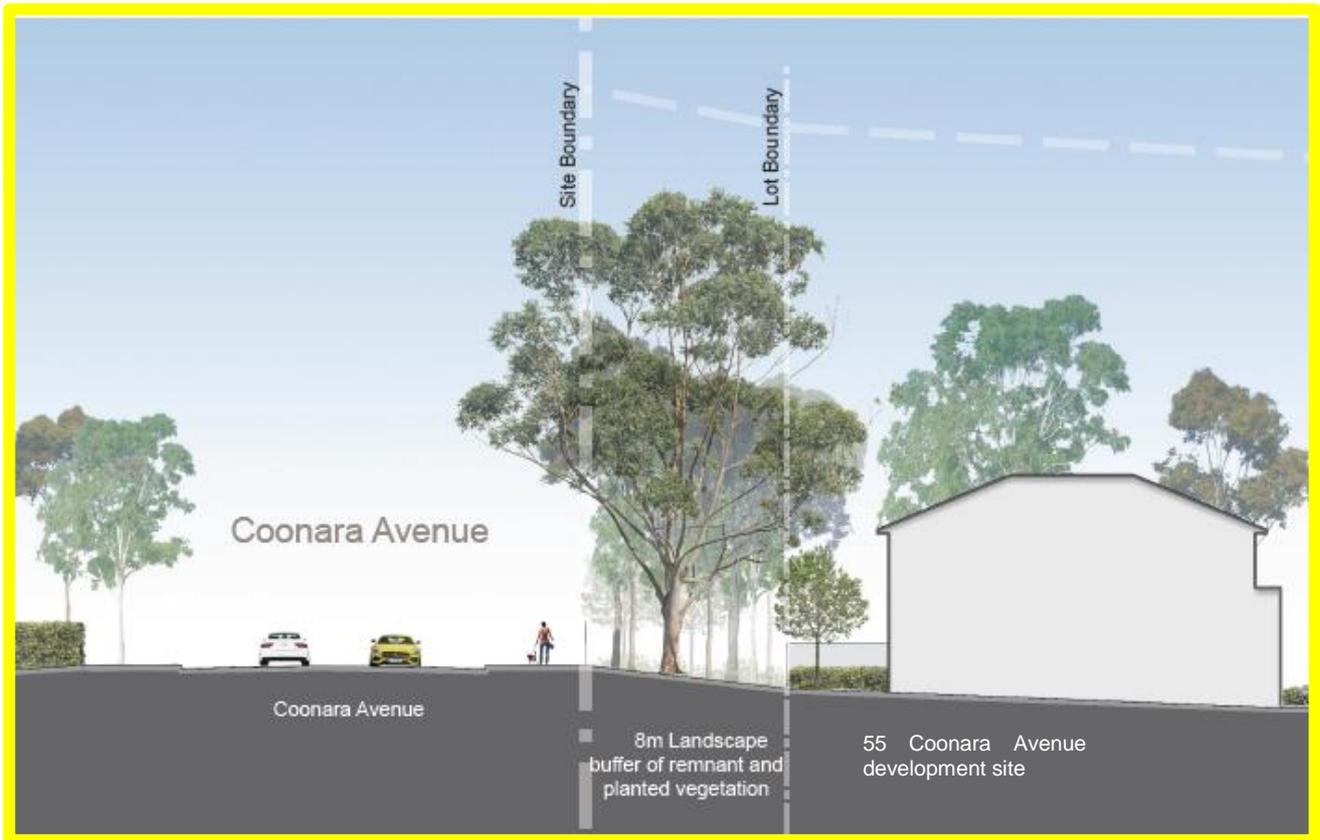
Indicative Section showing landscape buffer to Coonara Avenue
